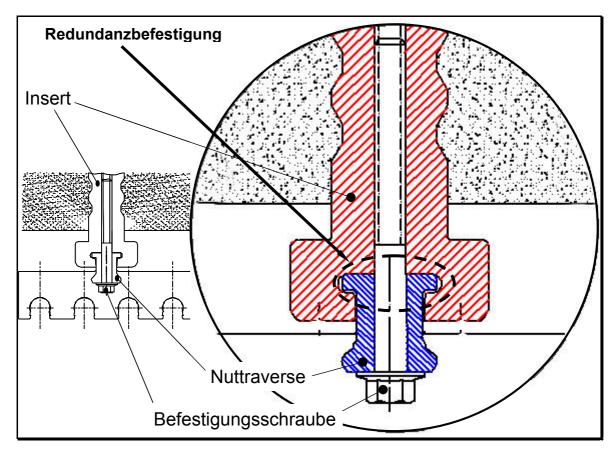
Example of a diverse redundant stator pack fixing on a concrete cantilever arm
